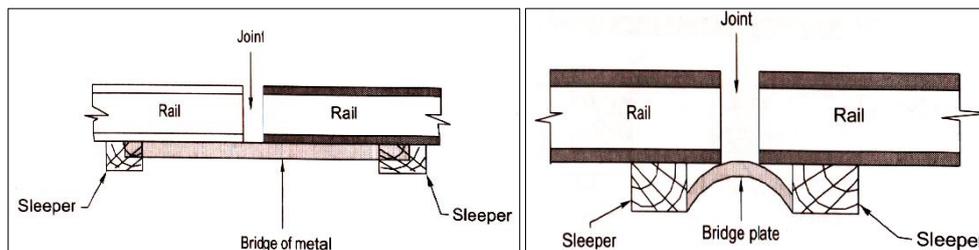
Bridge joint with metal flat and with bridge plate¹⁹
